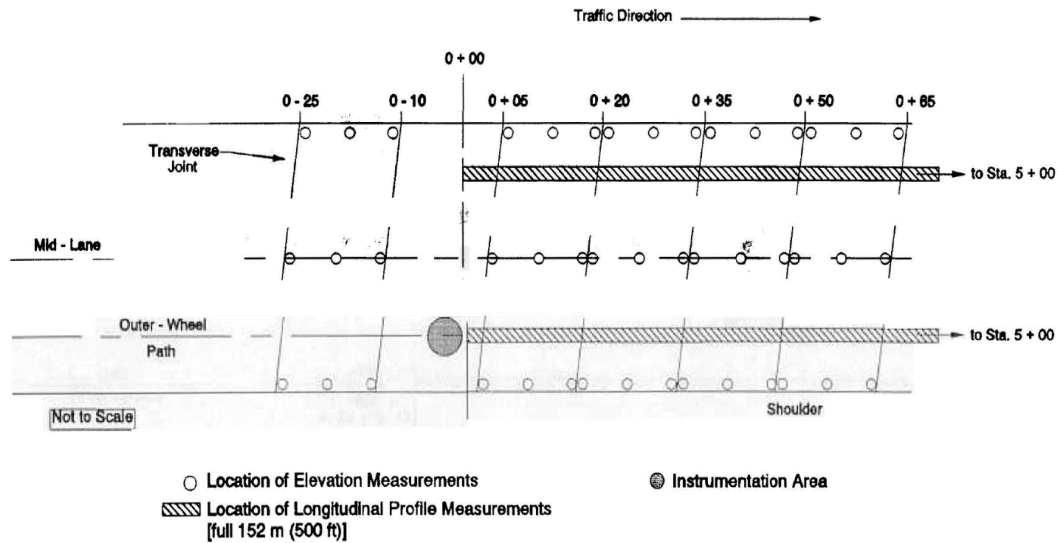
Elevation and Profile Data Collection Plan – JCP Pavements (Rada et al., 1994)
